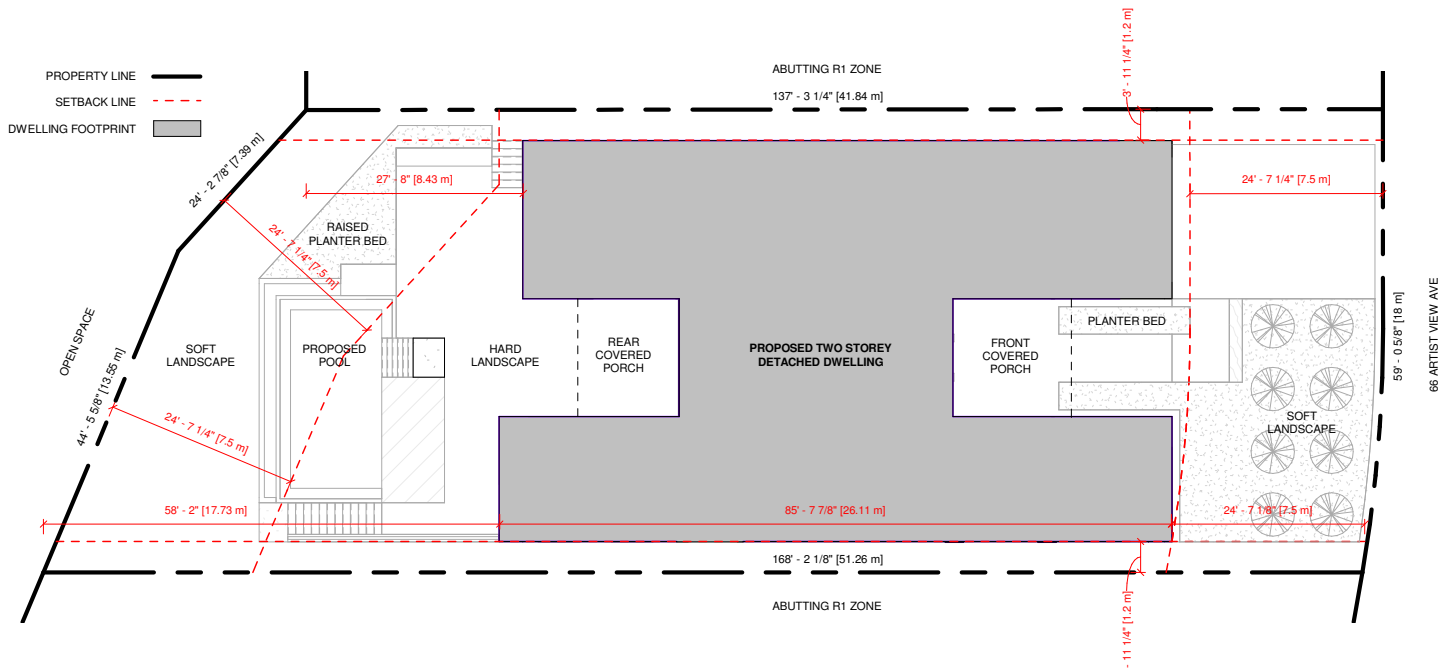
Proposed Development on lot with Zoning Setbacks and Building placement, shape + orientation.
